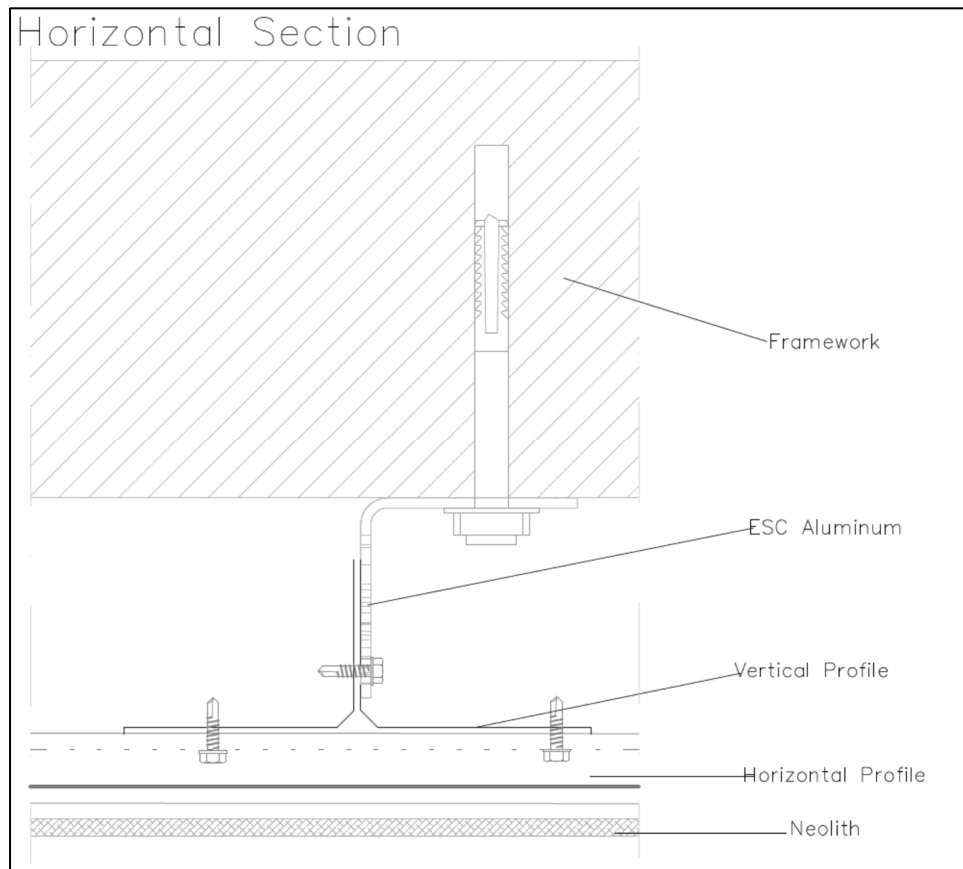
HORIZONTAL CROSS SECTION OF ASSEMBLY OF STRONGFIX SYSTEM COMPONENTS
